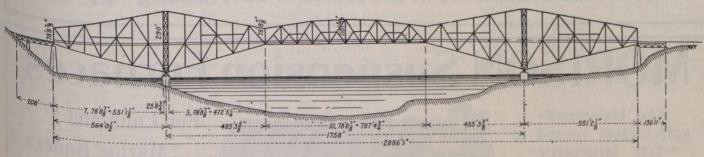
Unaccepted design of Maschinenfabrik Augsburg-Nuerenburg, for Quebec bridge.
